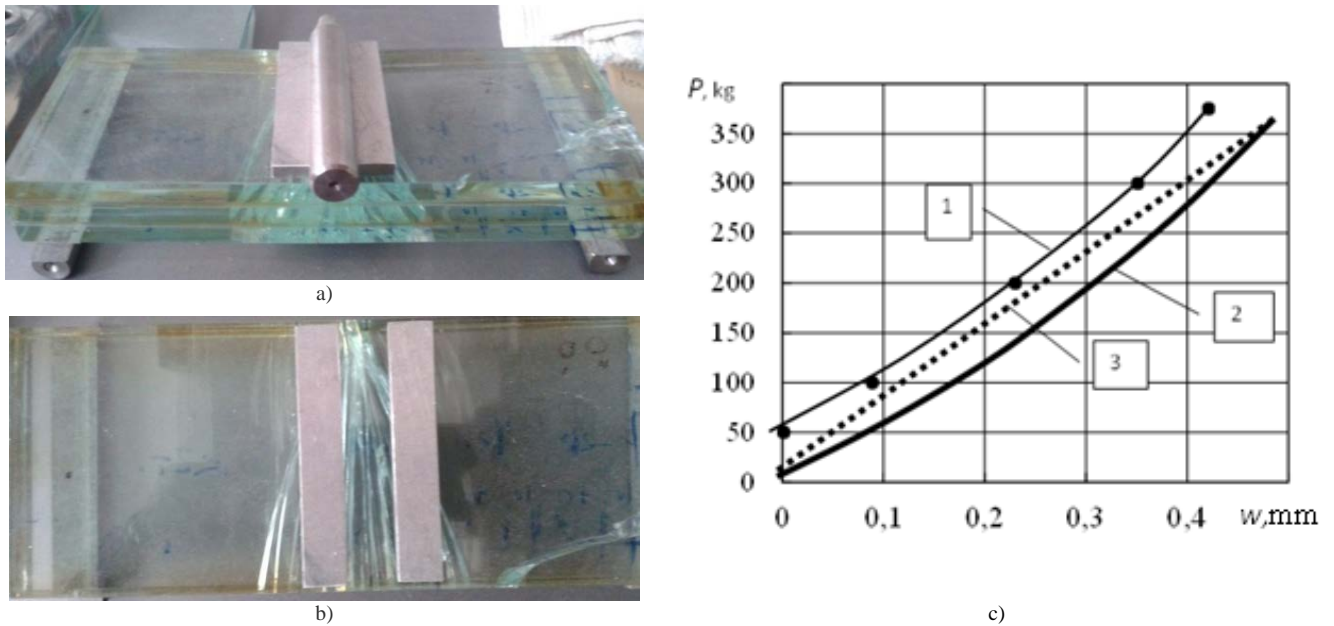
Loading device and fracture character of laminated specimen a), fracture source in the edge of bottom glass layer b) and loading diagram c) for triple layer specimen under three-point bending.
